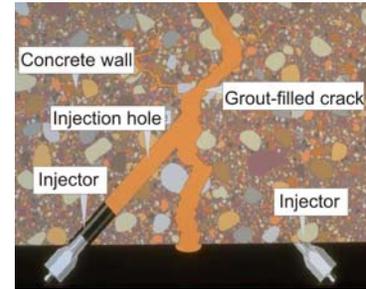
Pressure injection of grout through injection holes drilled in concrete (Henning, 2003)
